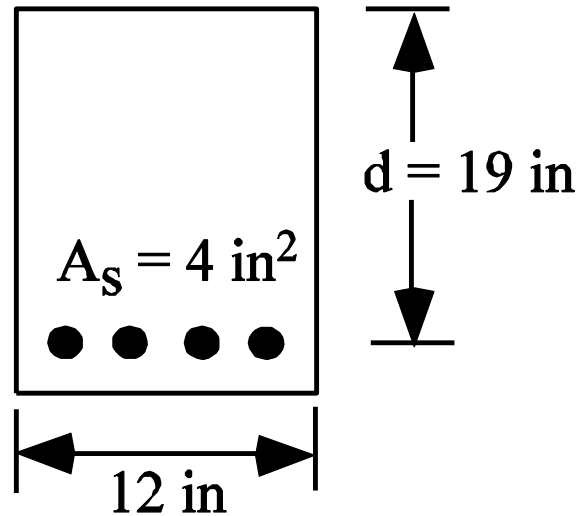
Cross-section of reinforced concrete beam considered in Example
